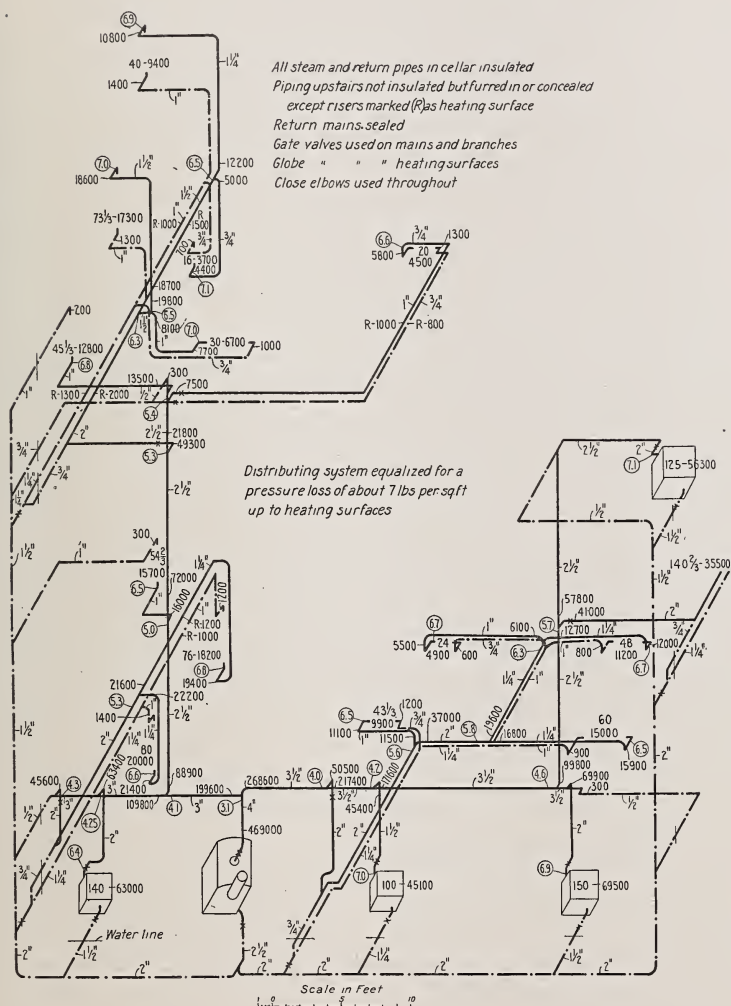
Example of low-pressure steam heating at 1 lb. pressure.
